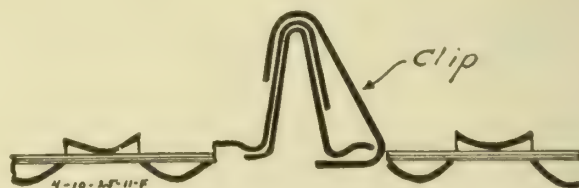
POSITION OF CLEATS TO HOLD SIDES OF PLATES TOGETHER BETWEEN BEARINGS
